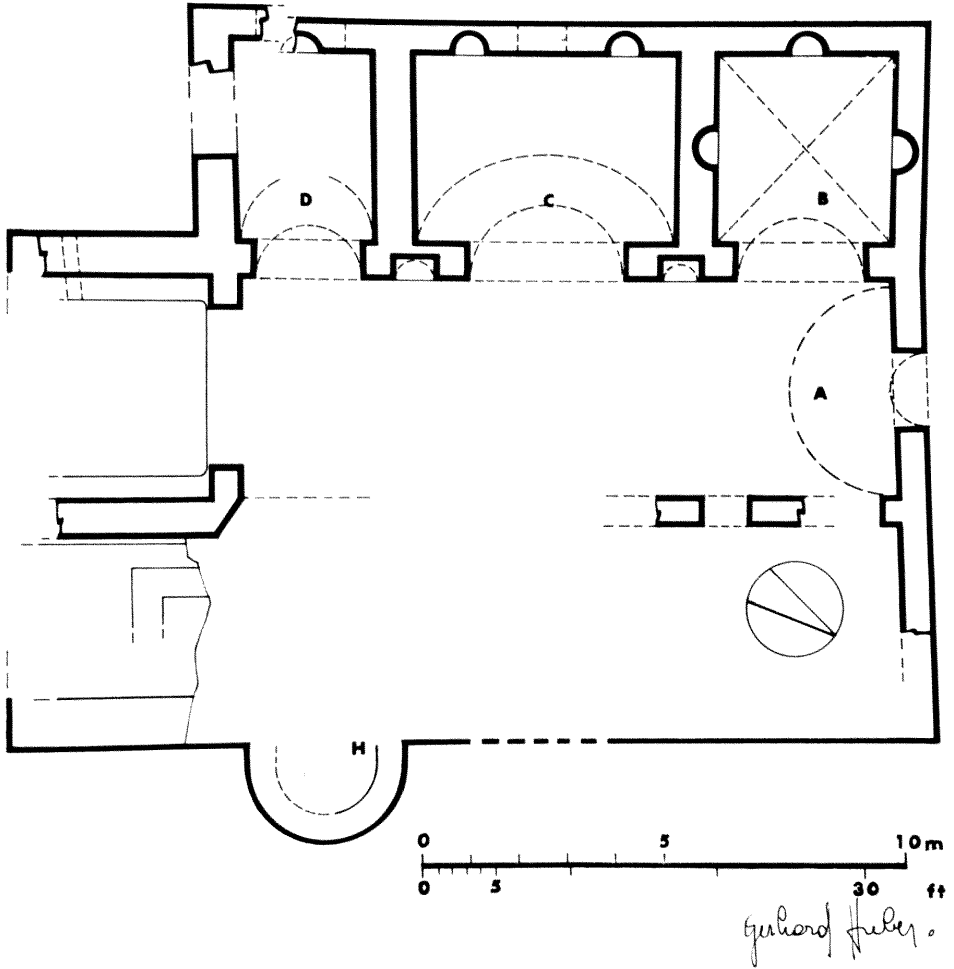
Plan of Baths II-1A, Syedra (Rosenbaum 1967, fig.32)
